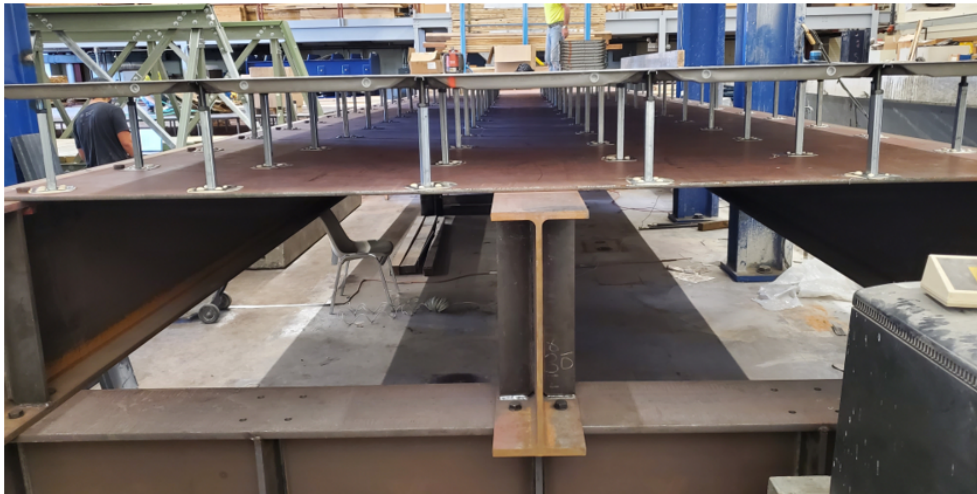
The heavy specimen (SM94_RAF) with W24x94 beams, a 1/2 in. thick plate, and raised access floor (RAF).
